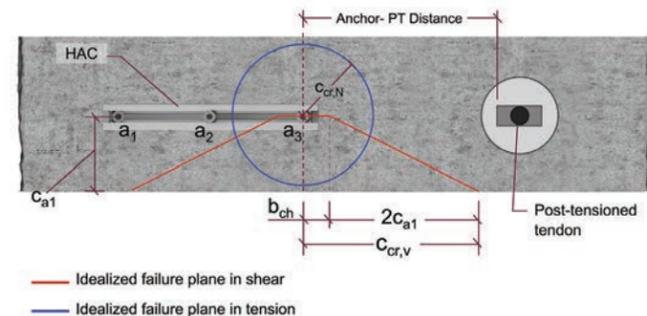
Face of slab configuration with live end of post-tensioned slab outside the anchorage zone.
